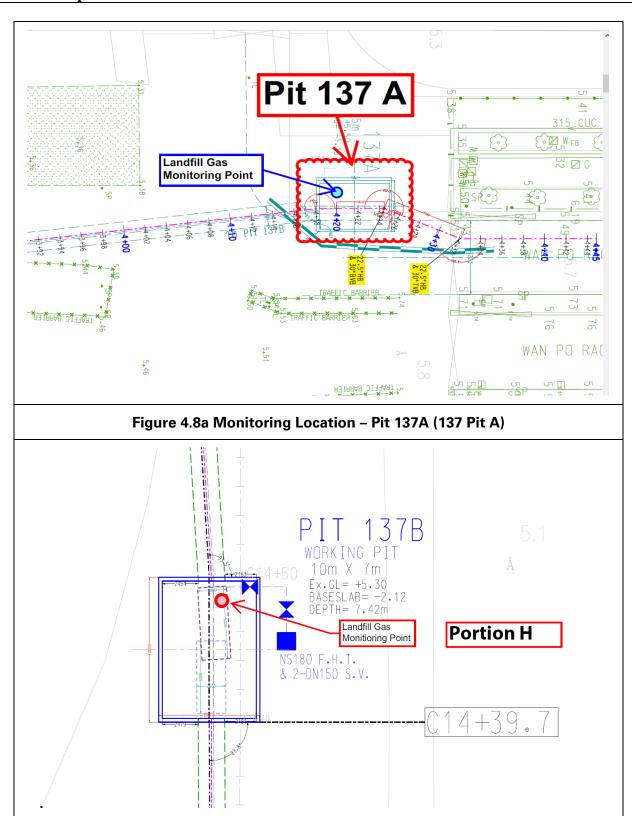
Monitoring Location – Pit 137B (137 Pit B)
